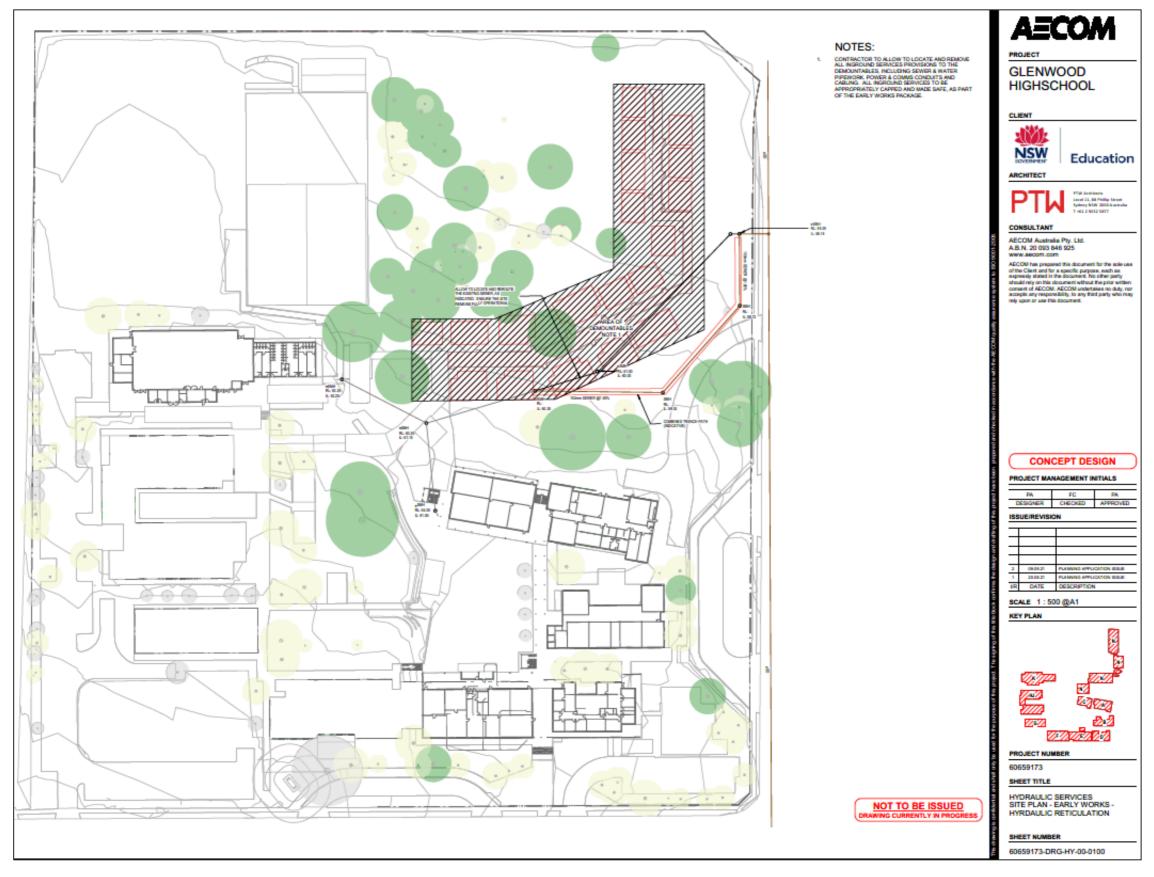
REF - Hydraulic services site plan (AECOM 2021)
